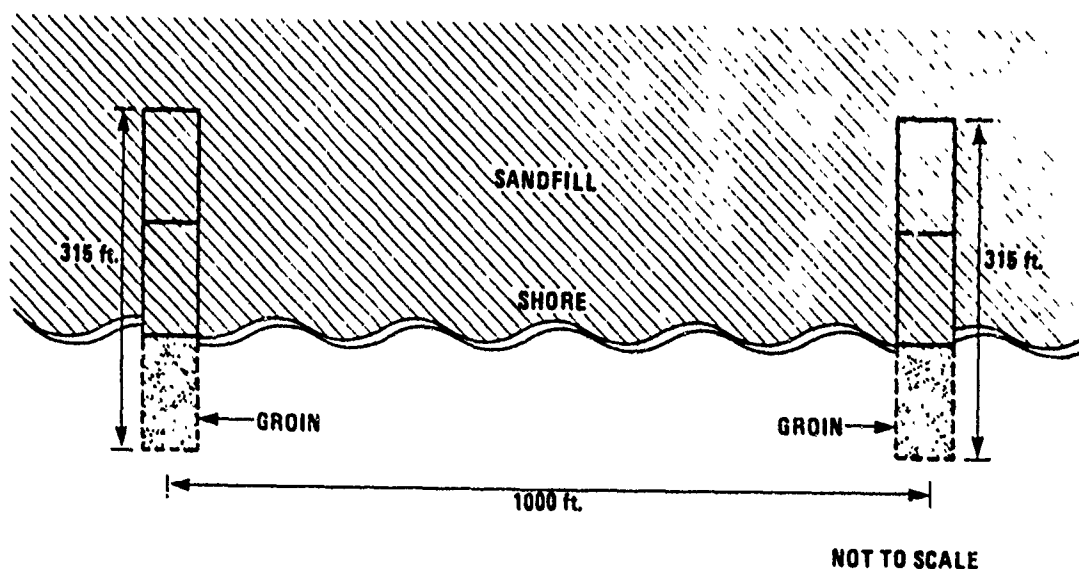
Plan VI - Stone Groins and Placed Sandfill
